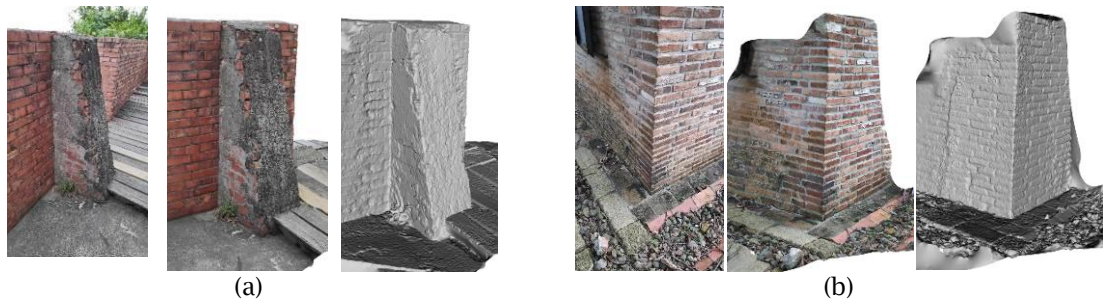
Image and 3D photogrammetric models of warehouse corner details: (a) wall & buttress; (b) building B.
